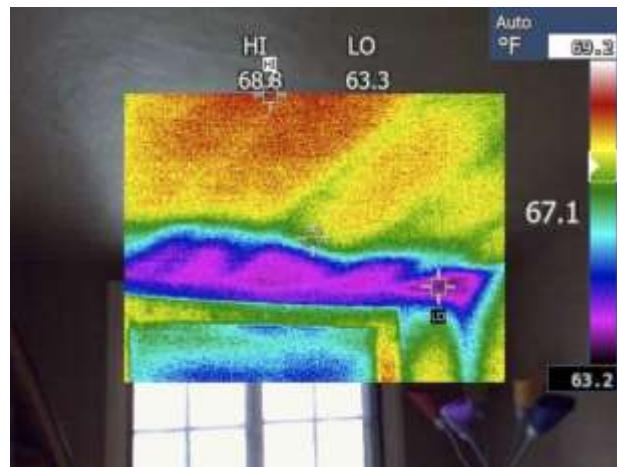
P2 missing insulation and/or air leakage at bedroom window
